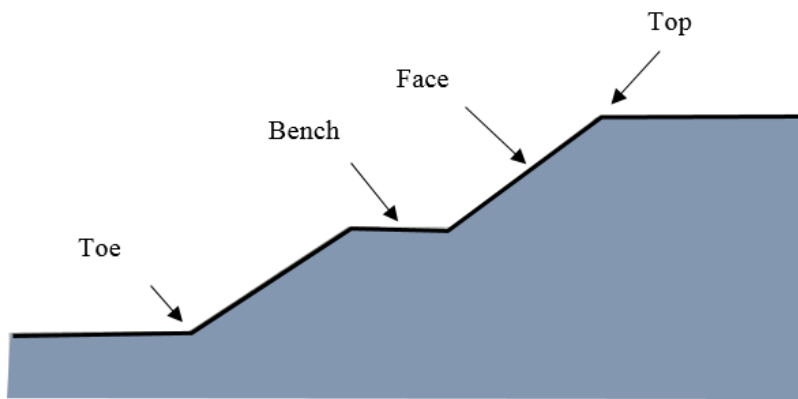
Example benched slope (adapted from Coduto et al., 2011)
